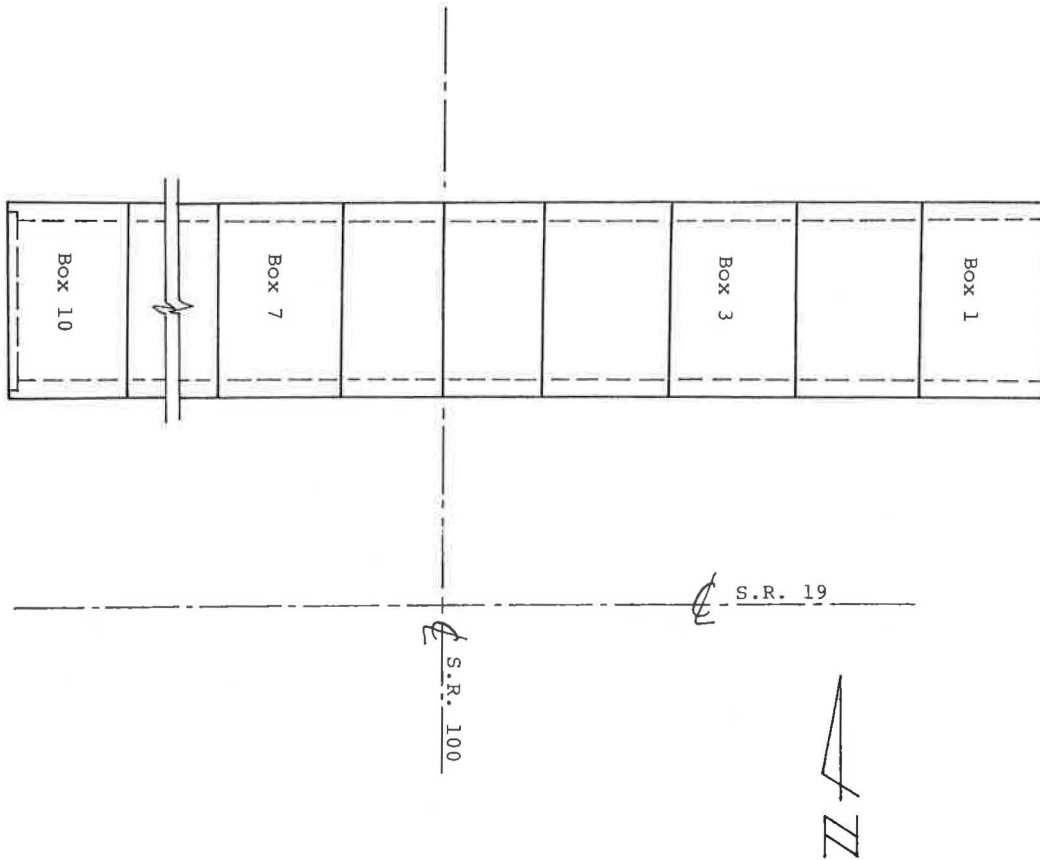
Arrangement of box culvert sections (Ohio DOT bridge CRA-19-17.10).
